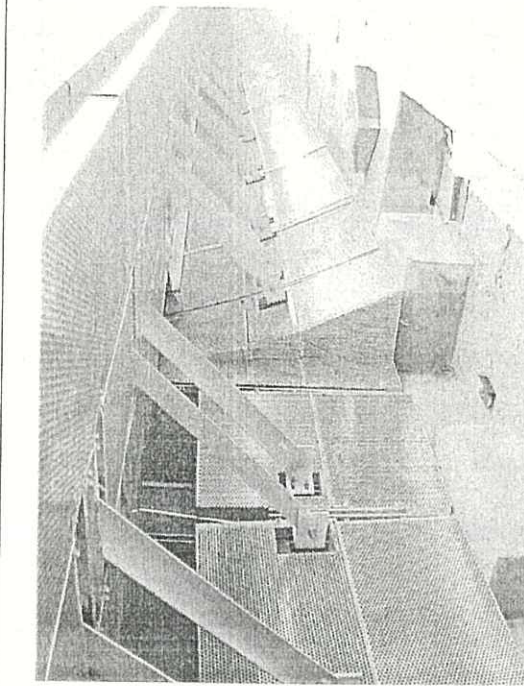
Acoustic Plenum Underneath Walkway at Siu Hong
